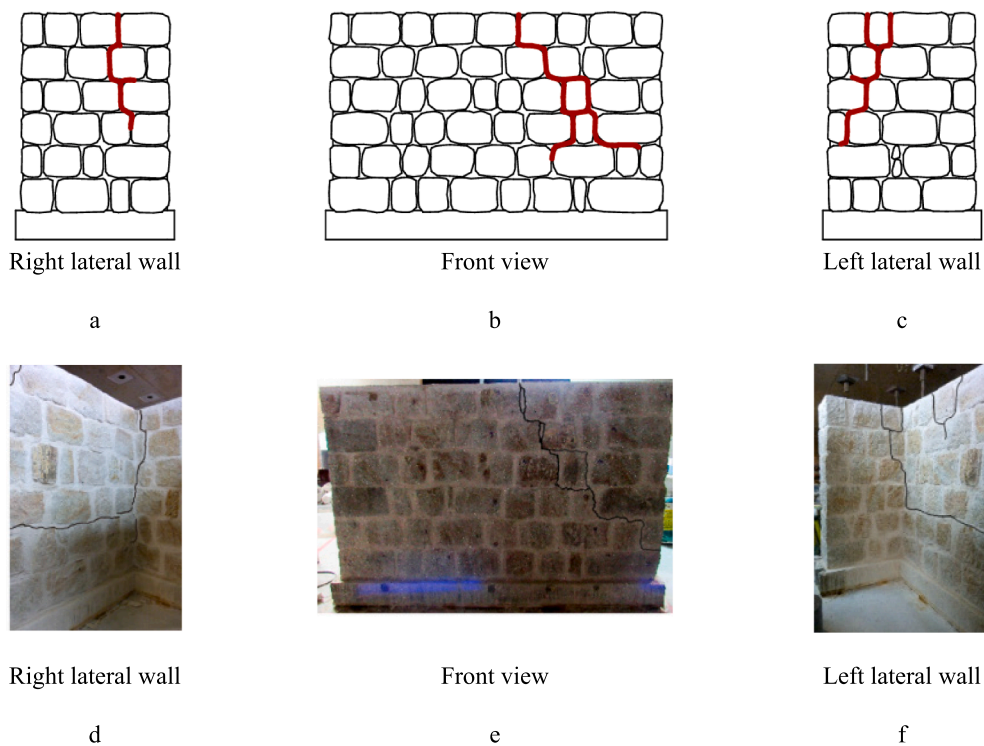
Experimental damage pattern regular stone masonry wall (REGW) [40].
